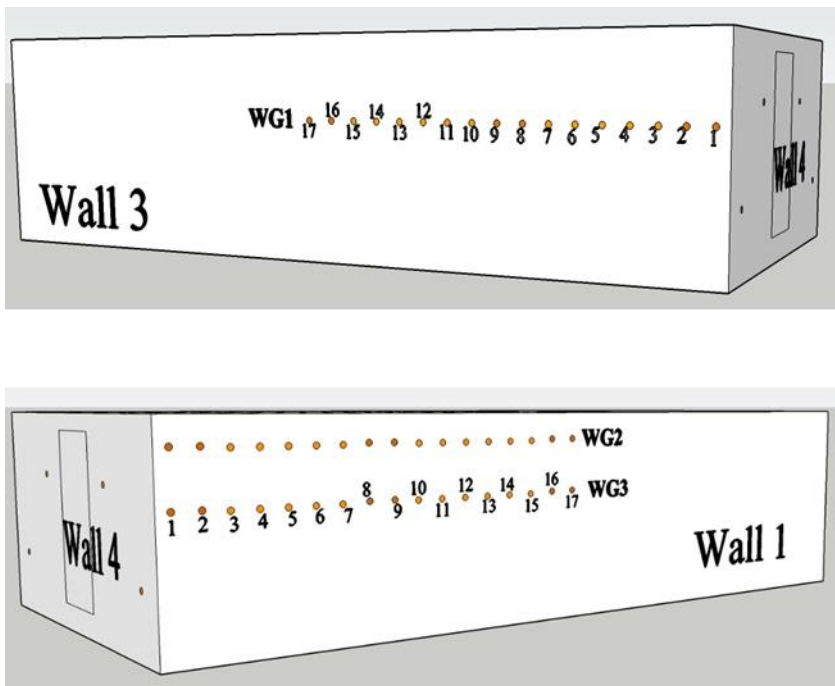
External pressure taps layout for Wall Girts WG1- WG3; taps 1 to 17- Model #1
